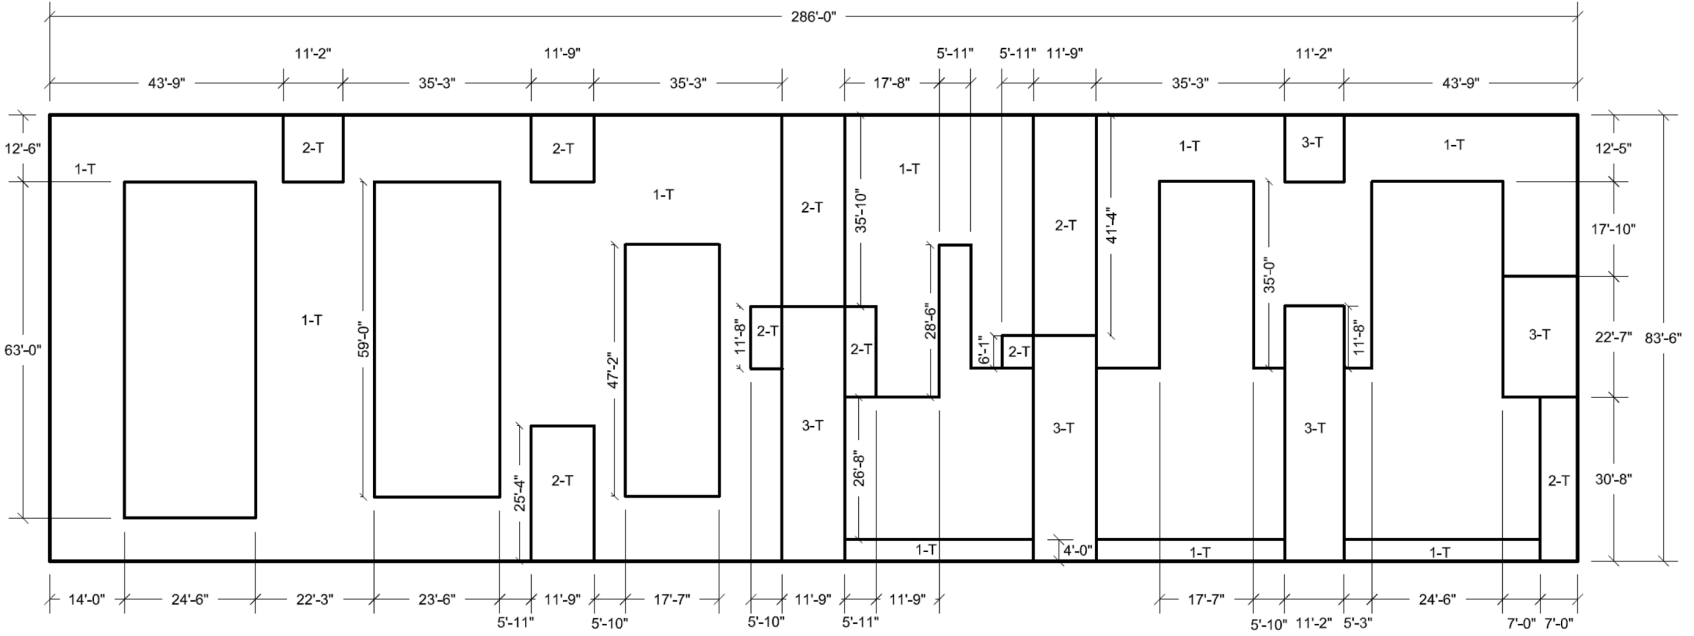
H.6-86 UHS Basin North Wall Looking South Transverse Reinforcement Zones
